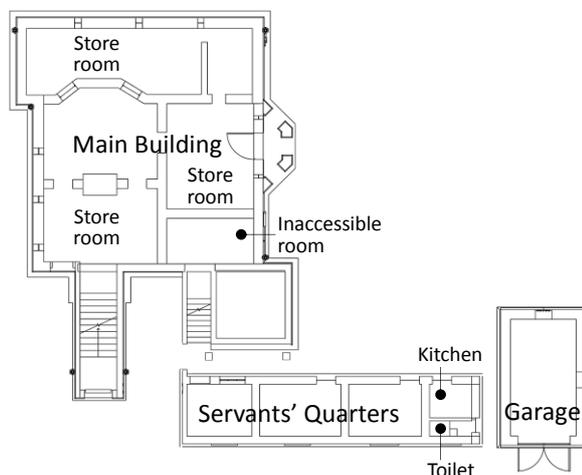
Existing ground floor plan, Drawn by Hannah Liu
